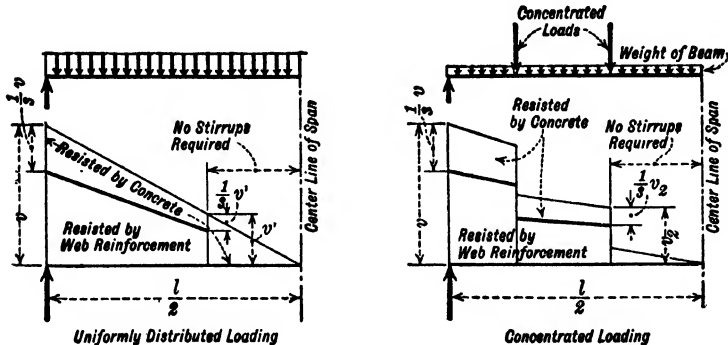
Second Method. Distribution of Diagonal Tension between Concrete and Web Reinforcement. (See p. 246.)
